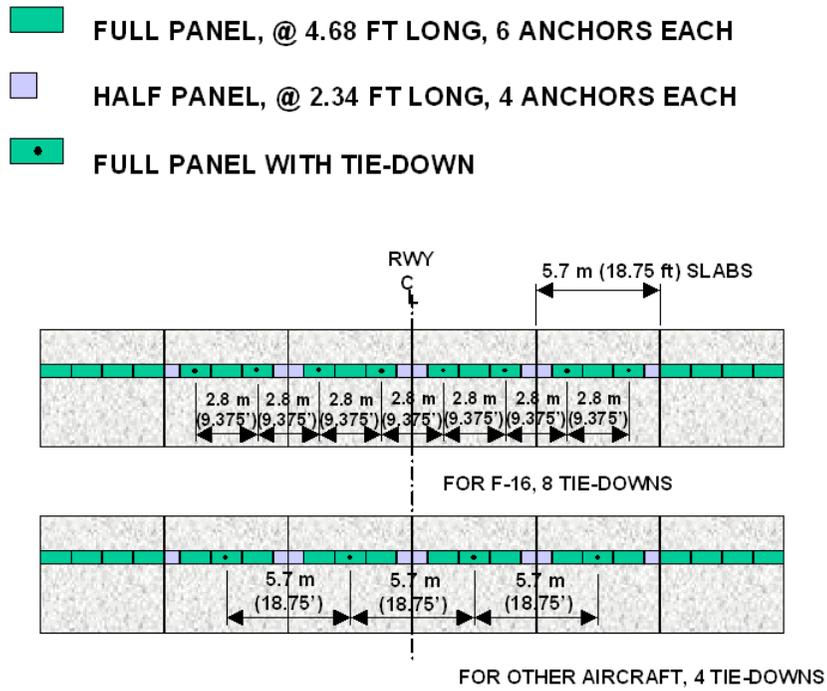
Cable Tie-down Locations for Panels Placed on 20-Foot Slabs.
